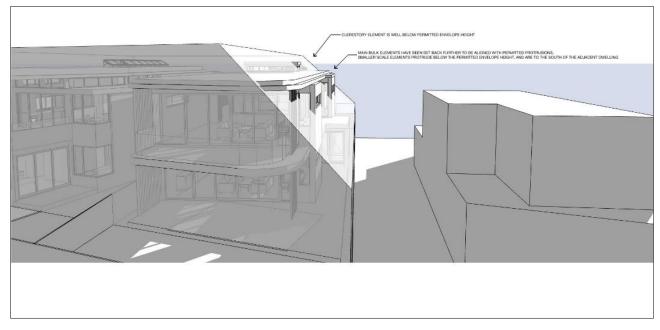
Building envelope study looking from the east (andrew smith architects, 2023)
